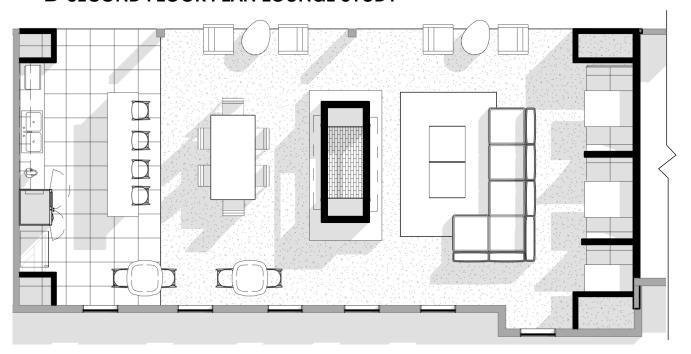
; Above shows the floor plan revision and precedent images for Second Floor Lounge B in St. Charles Hall.
